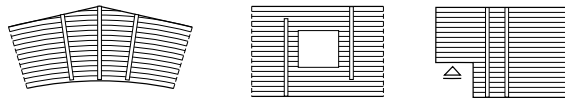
Glued-in rods to avoid cracks (pitched cambered beam, opening, notch). (STEP 1995 Article C14)
